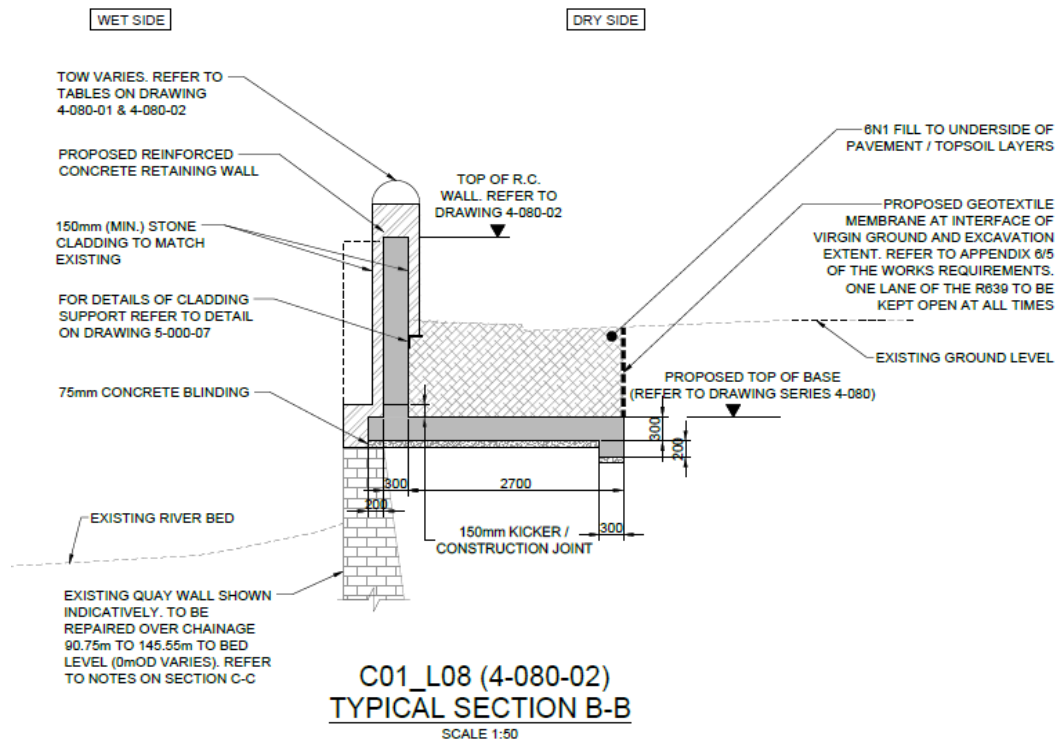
The Grove Proposed Reinforced Concrete Flood Defence Wall Typical Cross Section
